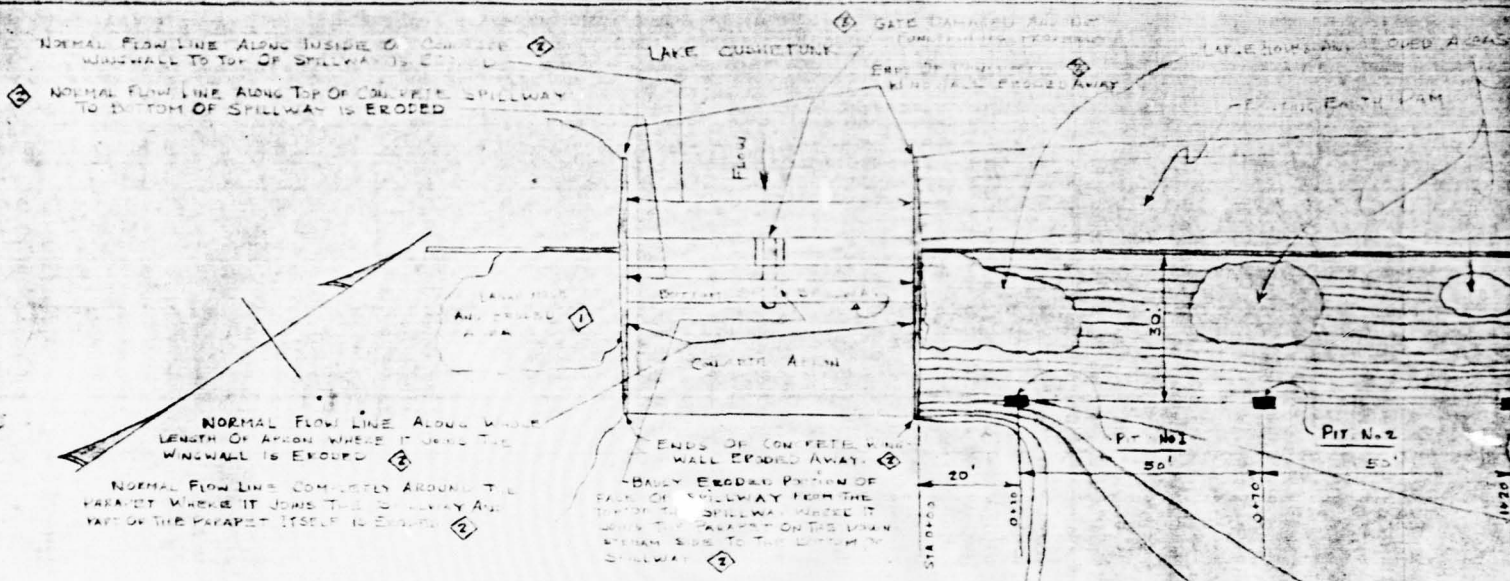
DETAILS OF PROPOSED AUXILIARY SPILLWAY
